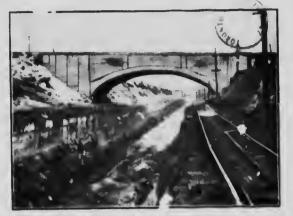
WARASH RAILWAY BRIDGE OVER CANAL
